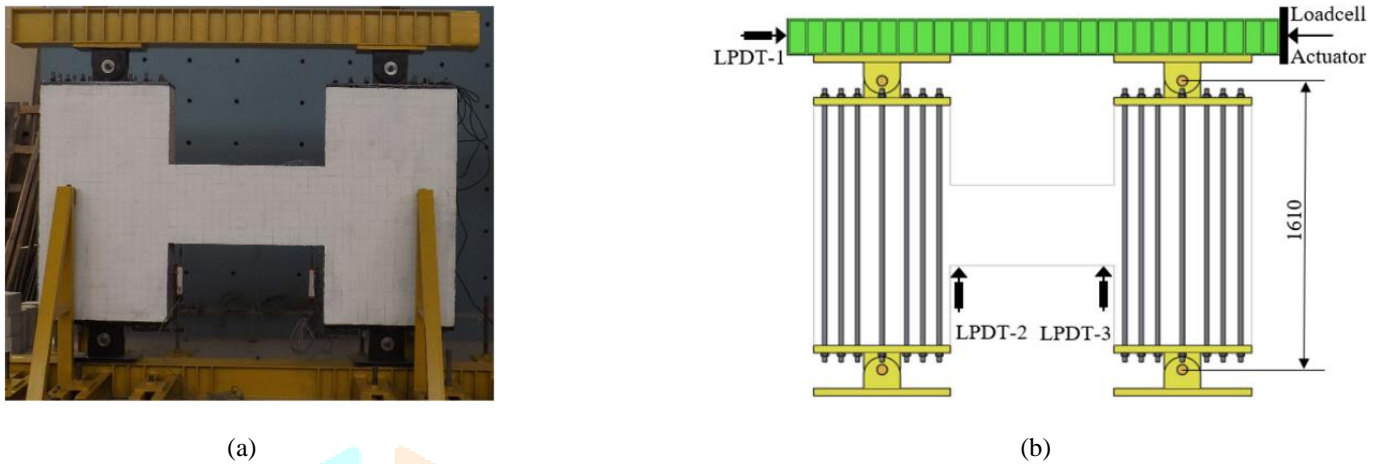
Test setup: (a) fabrication in laboratory (b) installation of instruments
